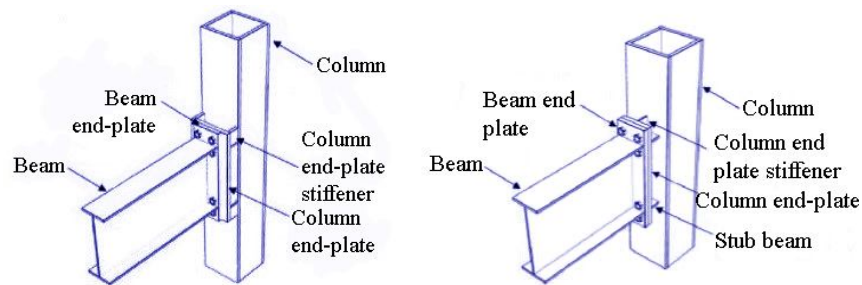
Typical configurations of connection model of connections with short stub beam.
